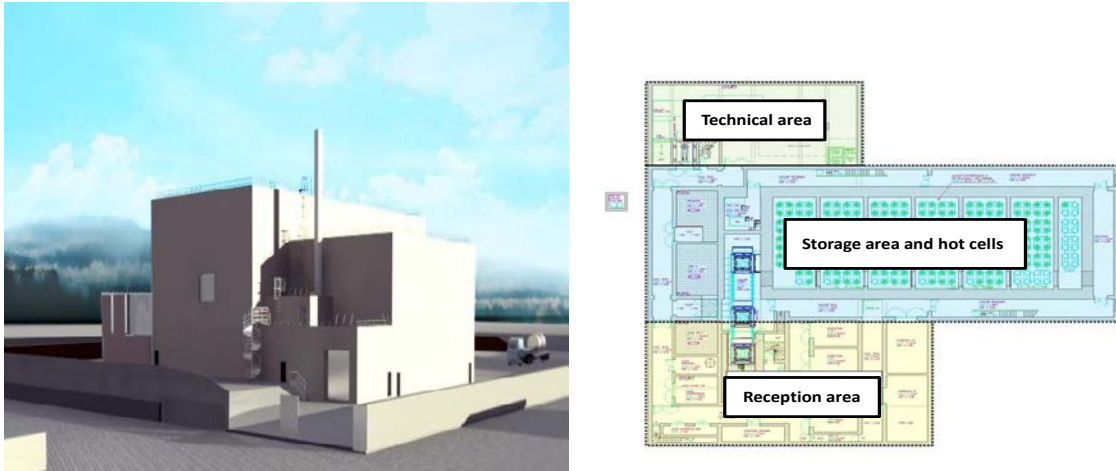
Schematic diagram and floor plan of the DIADEM facility
